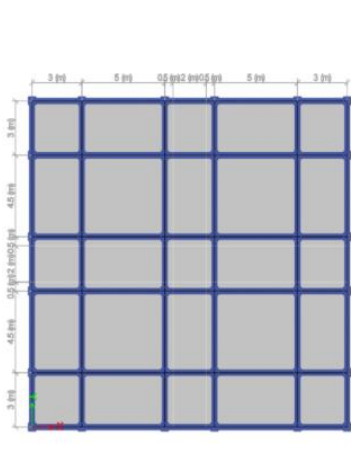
shows the G+10 storey building with telecommunication tower at center.
